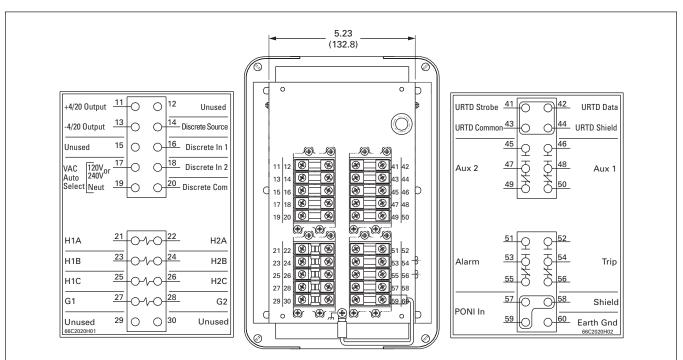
Rear View of MP-3000 Drawout Outer Case — Dimensions in Inches (mm)
